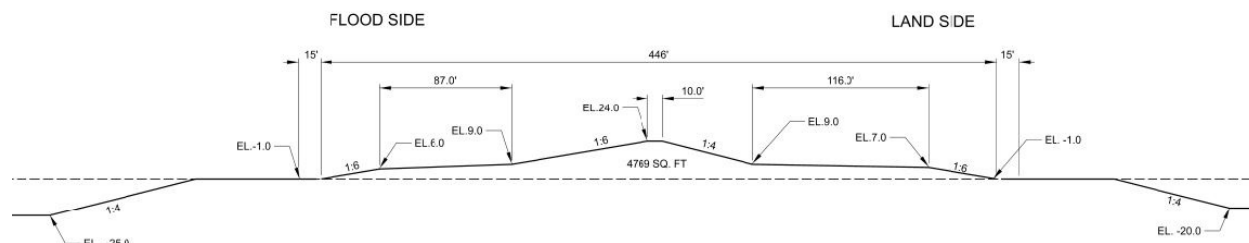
Typical Section Reach J-2 – Not to Scale (NTS)
